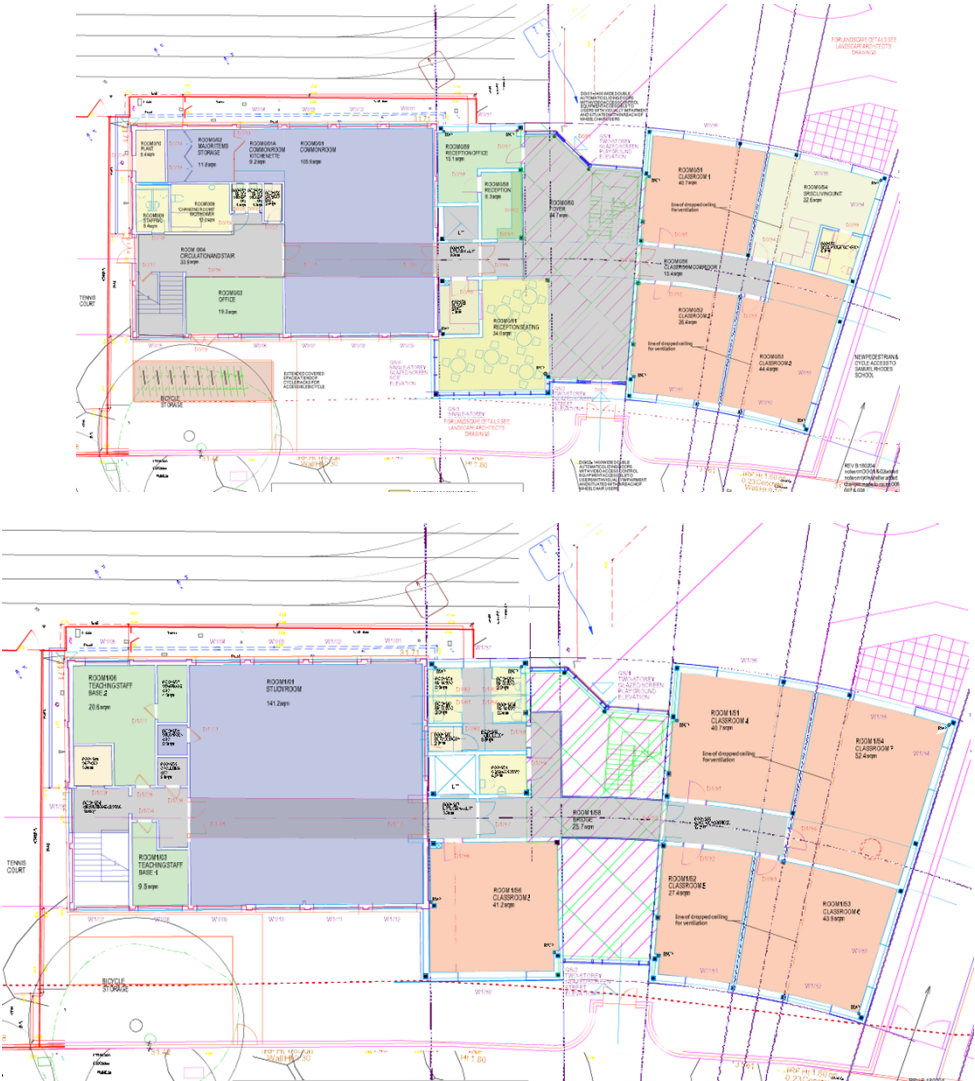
Proposed floor plans showing layout at both ground and first floor levels
